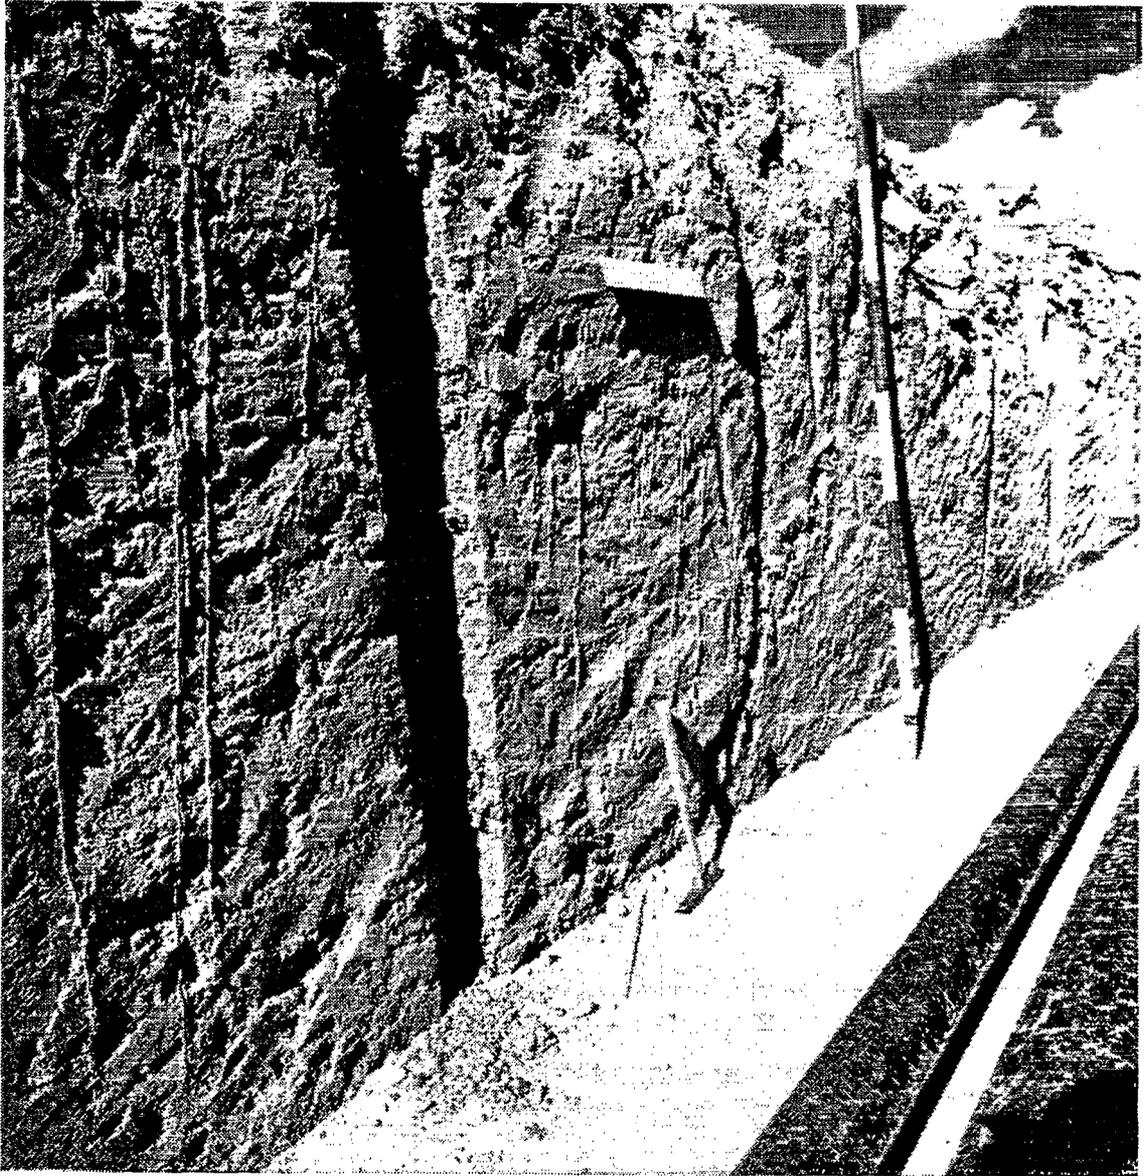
Joints, Section A, Numbers 90 and 91 (Appendix A) showing a typical cooling joint intersection of about 120° .
